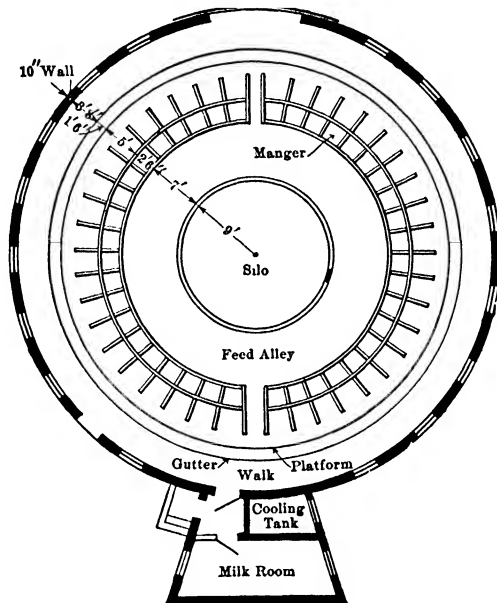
Floor plan of round barn for forty cows. (Ill. Exp. Sta.)
